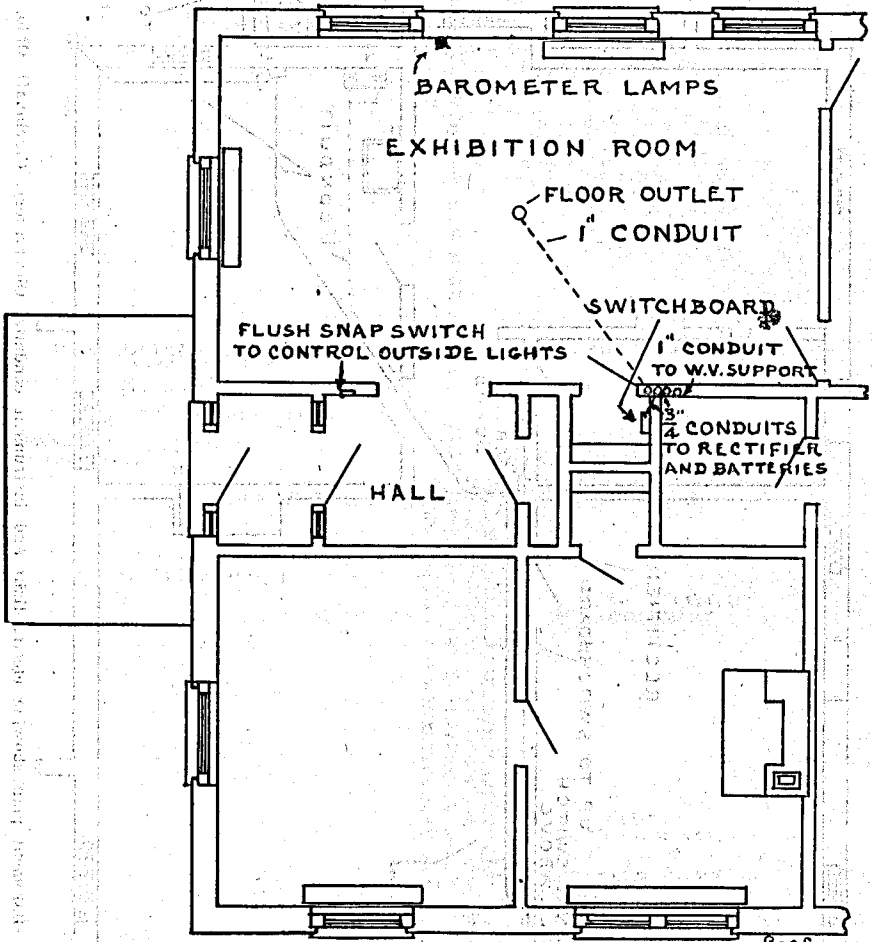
First-floor plan showing instrument circuits, Observatory, Cincinnati, Ohio.
